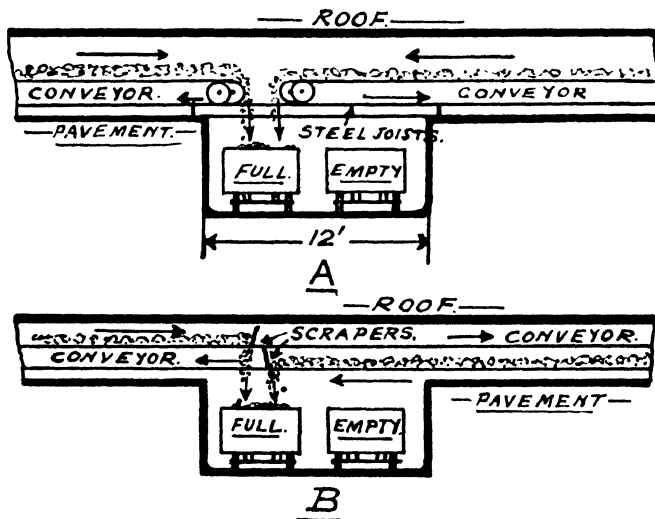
Sections showing Coal-filling Arrangements on Centre Road of Longwall Workings.
